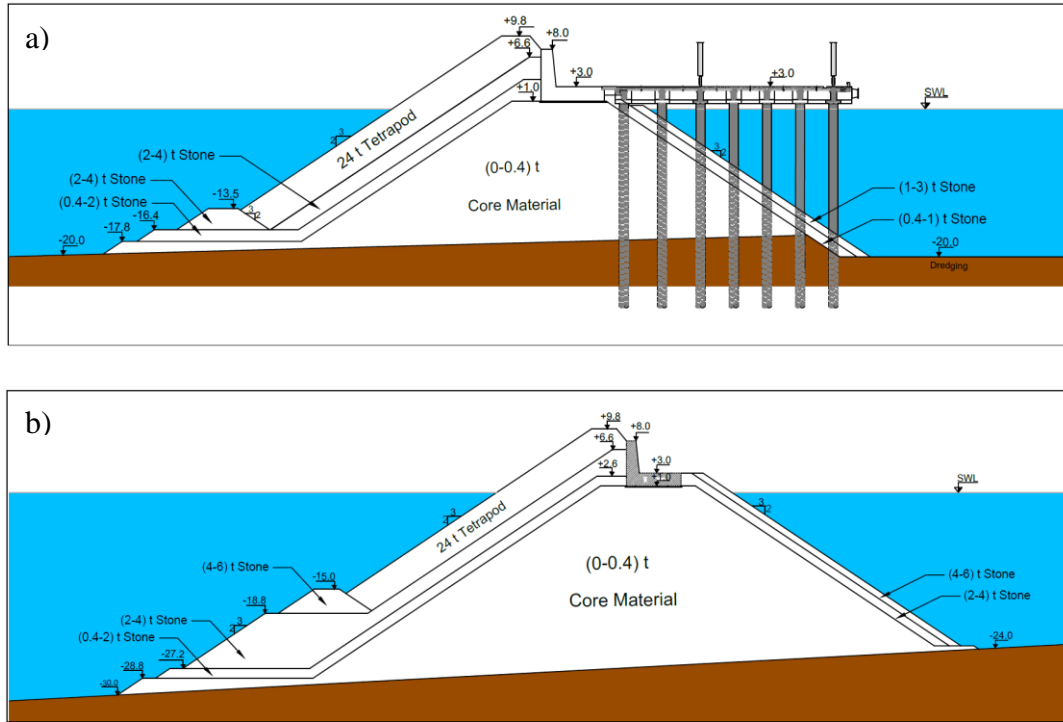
The original cross-sections along the main breakwater in prototype scale: a) Section 4-4 and b) Section 2-2
